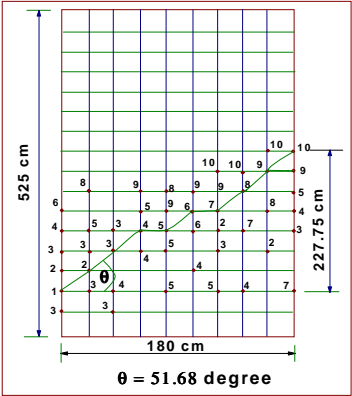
Crack propagation for RC pier with shear reinforcement = 0.05%.
